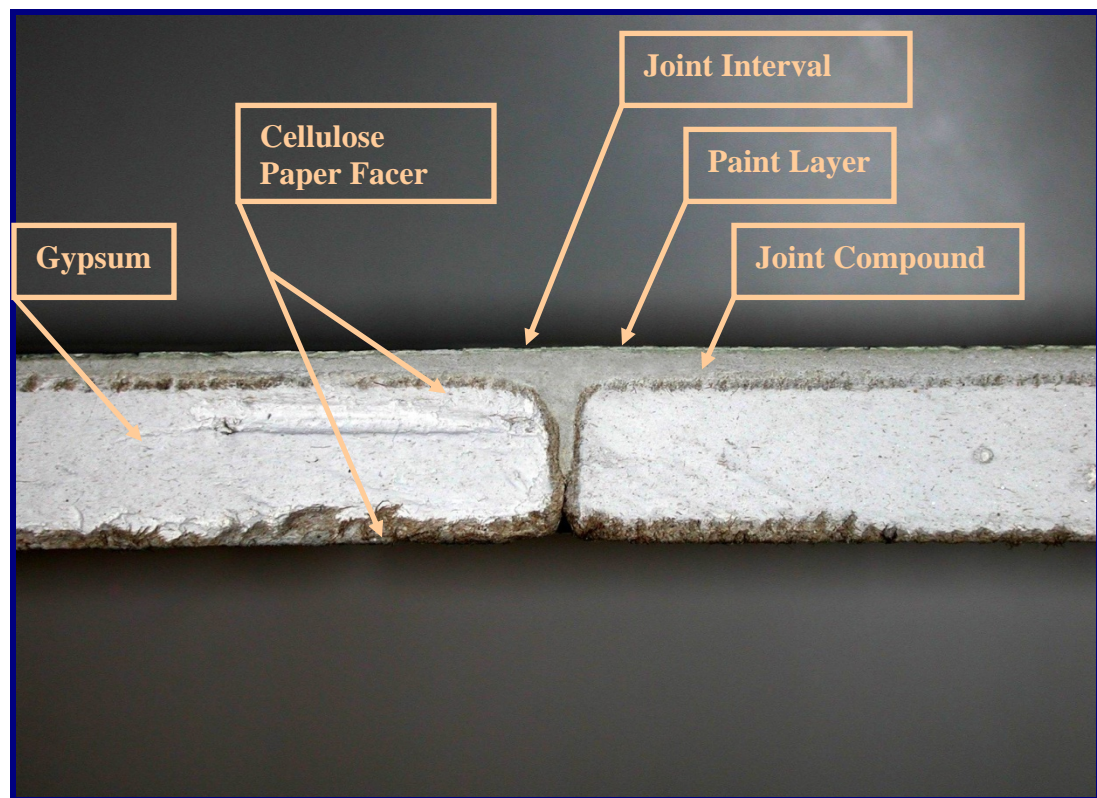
Section of 1/2-inch gypsum wallboard showing a multi-layered joint interval.
